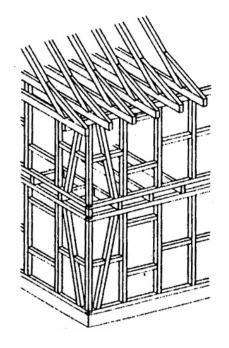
d – Timber frame house; Lucerne, Switzerland
